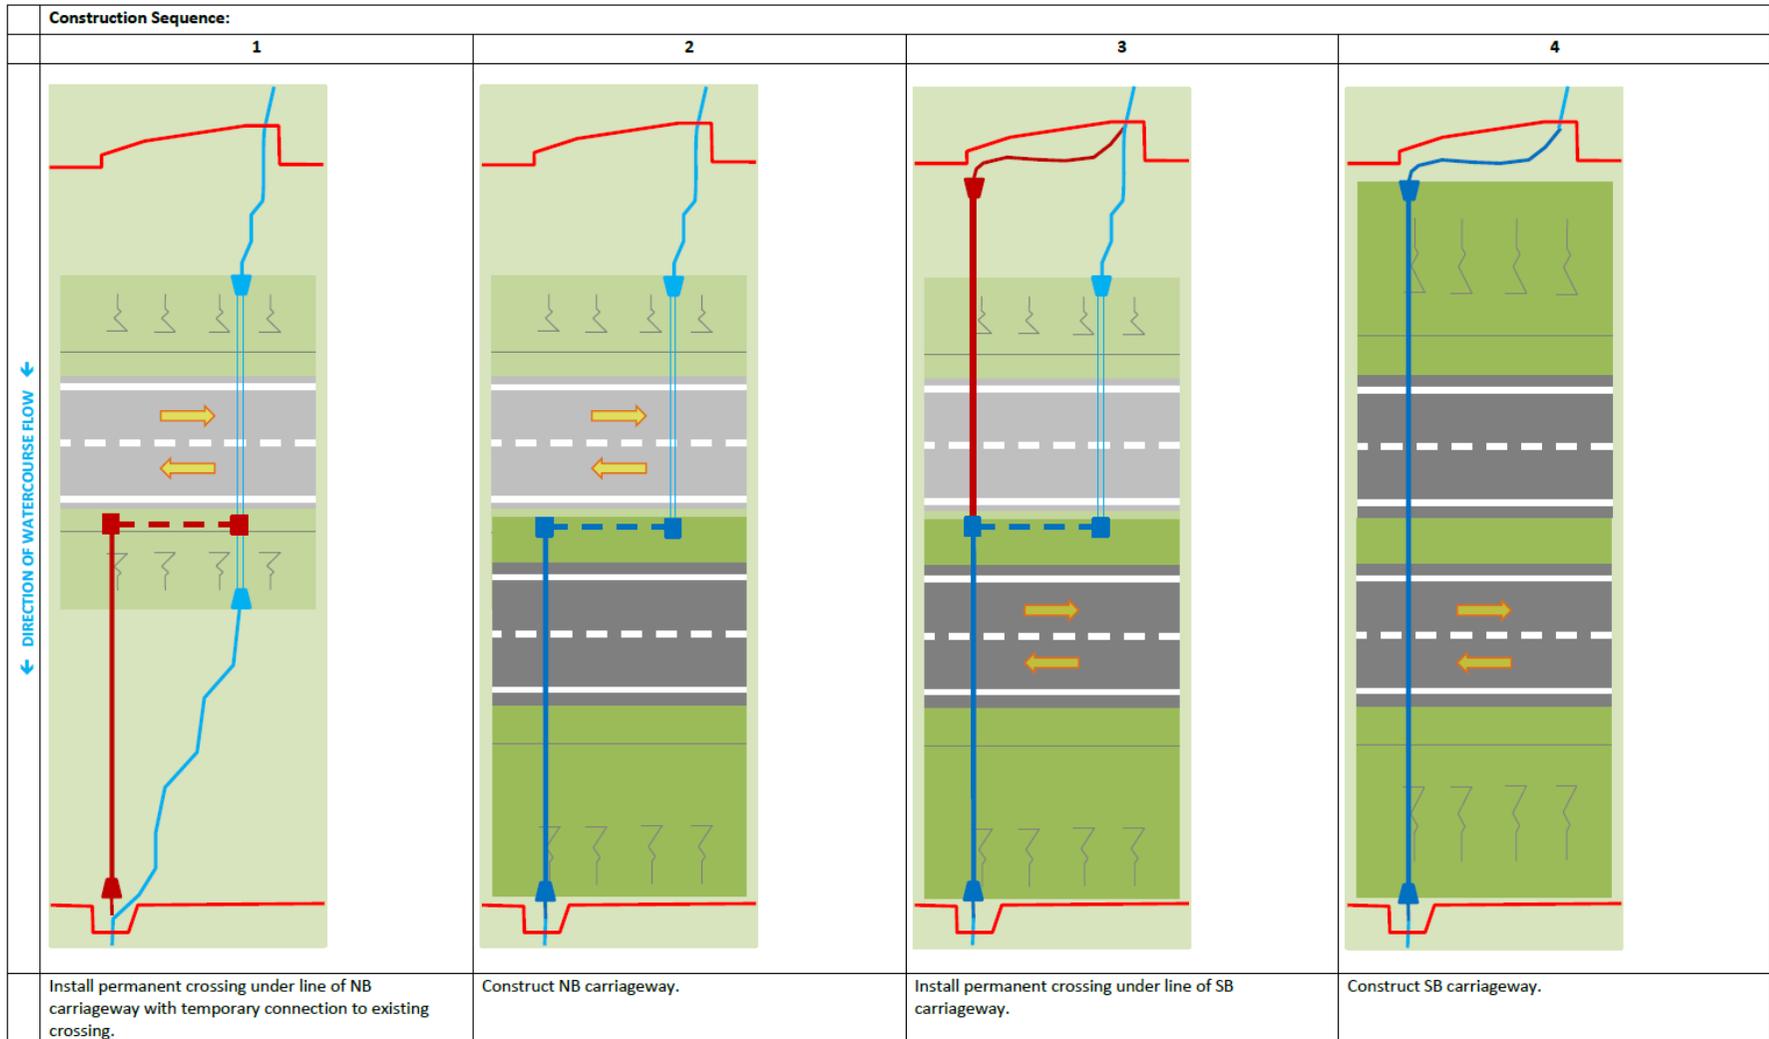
Widening to the west – road on embankment – off-line watercourse alignment
